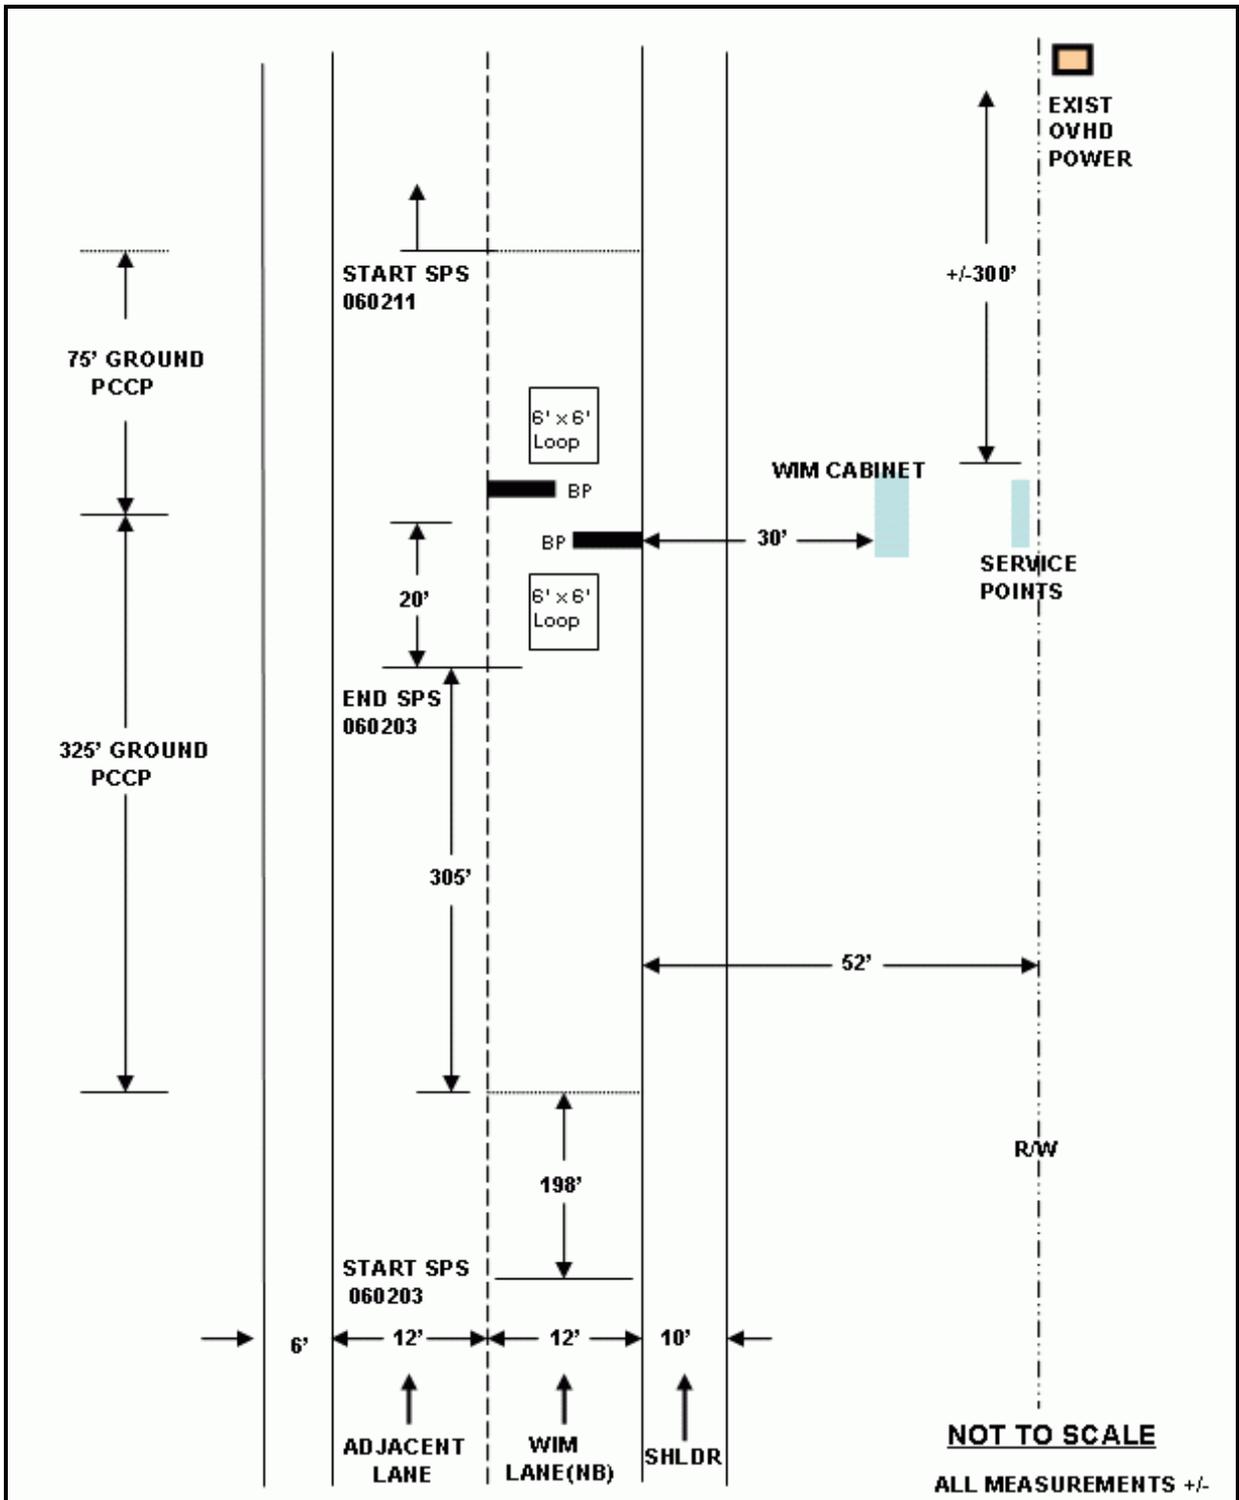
Proposed SR-99 SPS-2 WIM Site Layout
